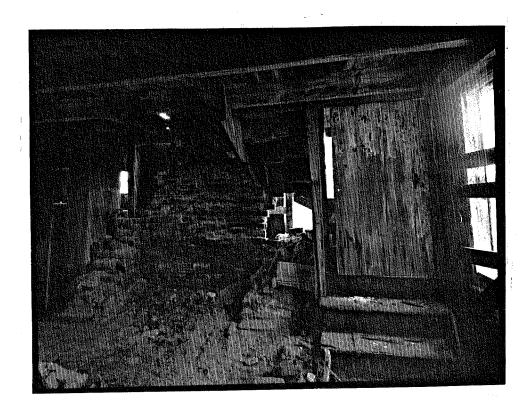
Hermitage Quarter, first floor: view of south fireplace and stair wall looking south.
